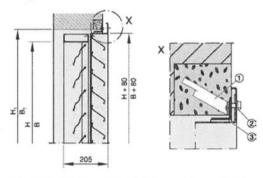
Installation with installation subframe (WG-KUL-1 shown)
